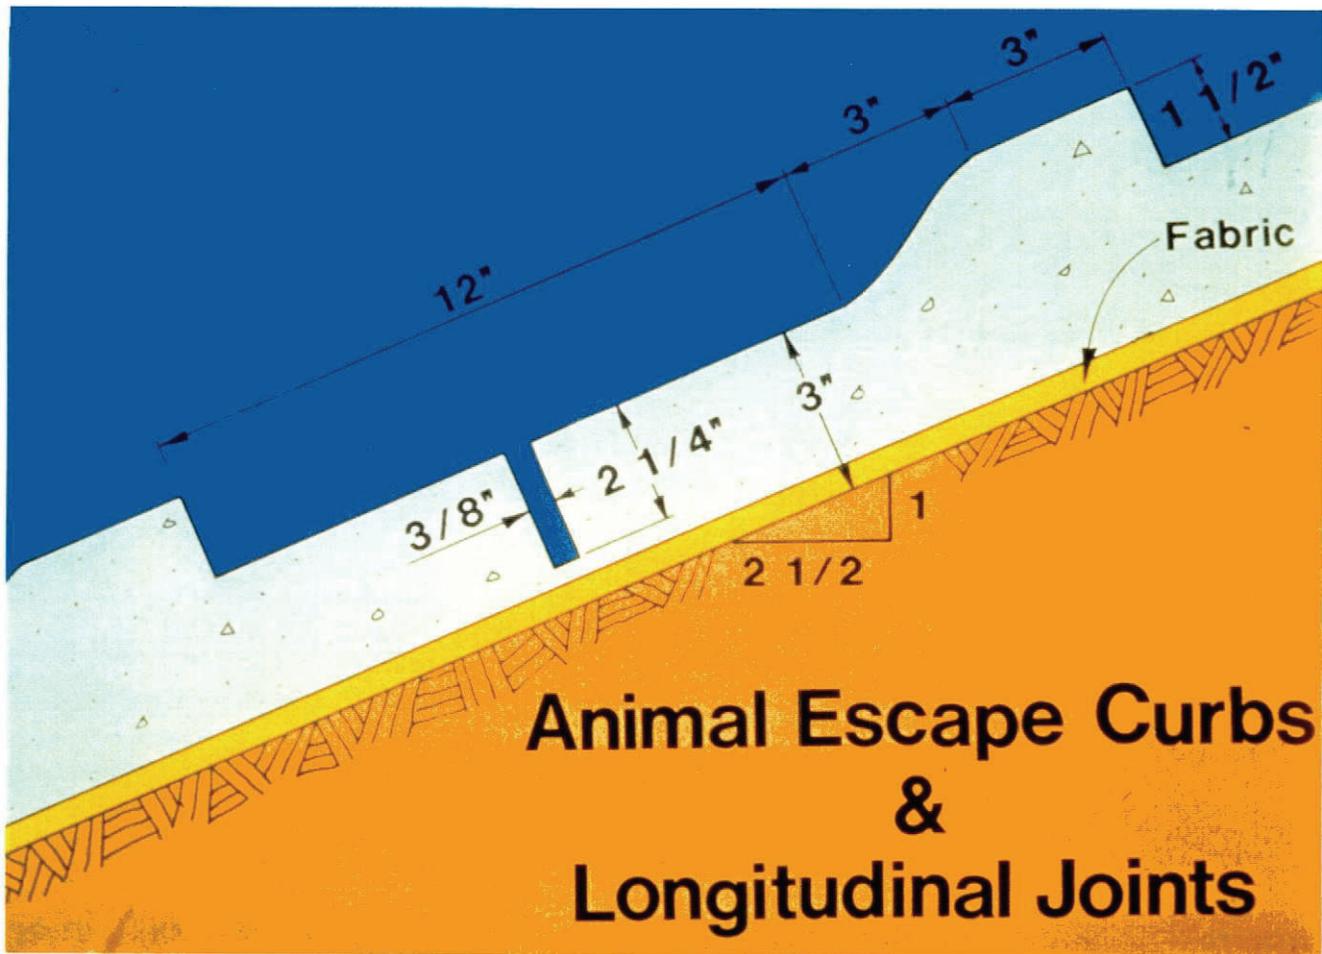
Schematic of the animal escape curbs and longitudinal joints.
